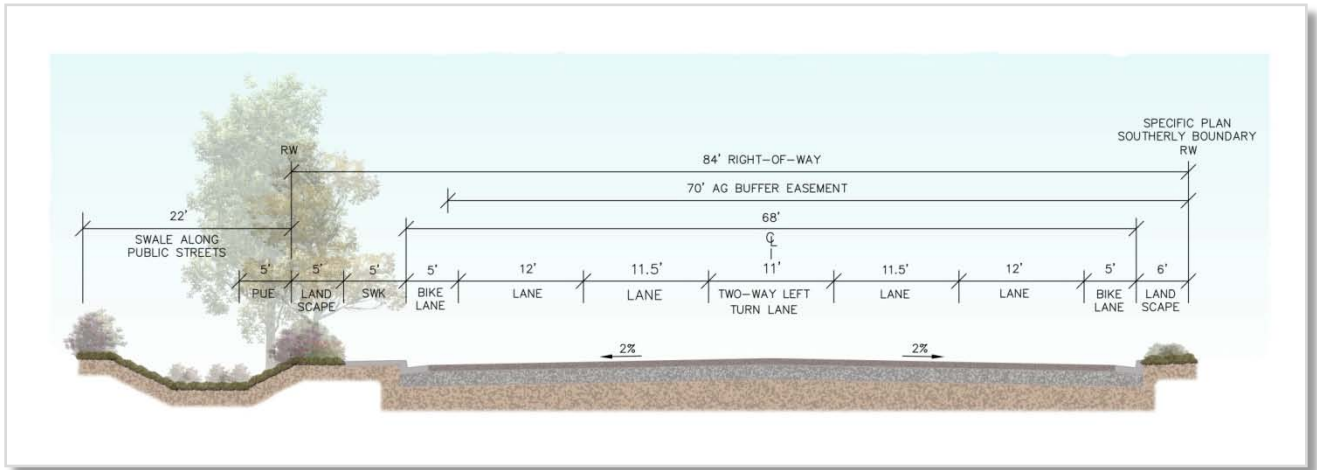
Proposed Harris Road, Northeast of Harris Place
